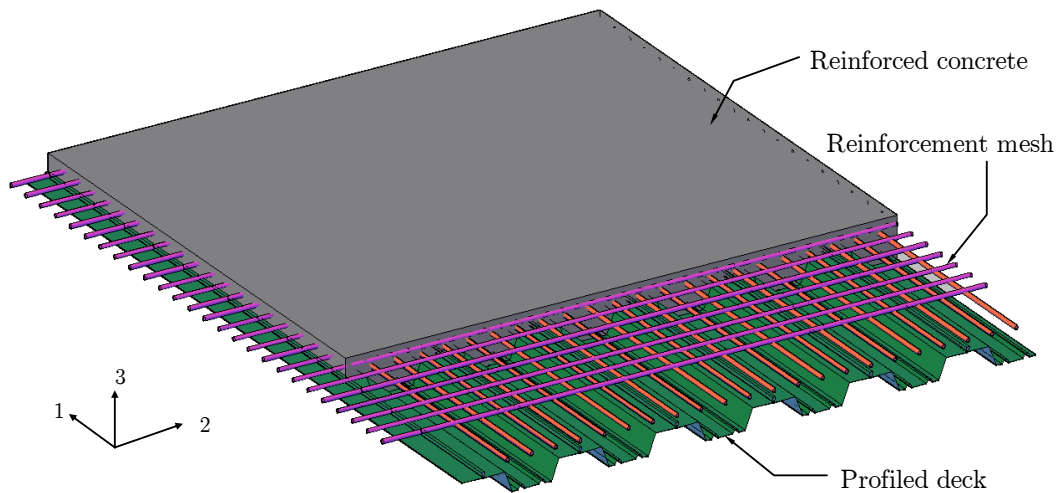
Composite slab comprises of profiled deck and reinforced concrete slab
